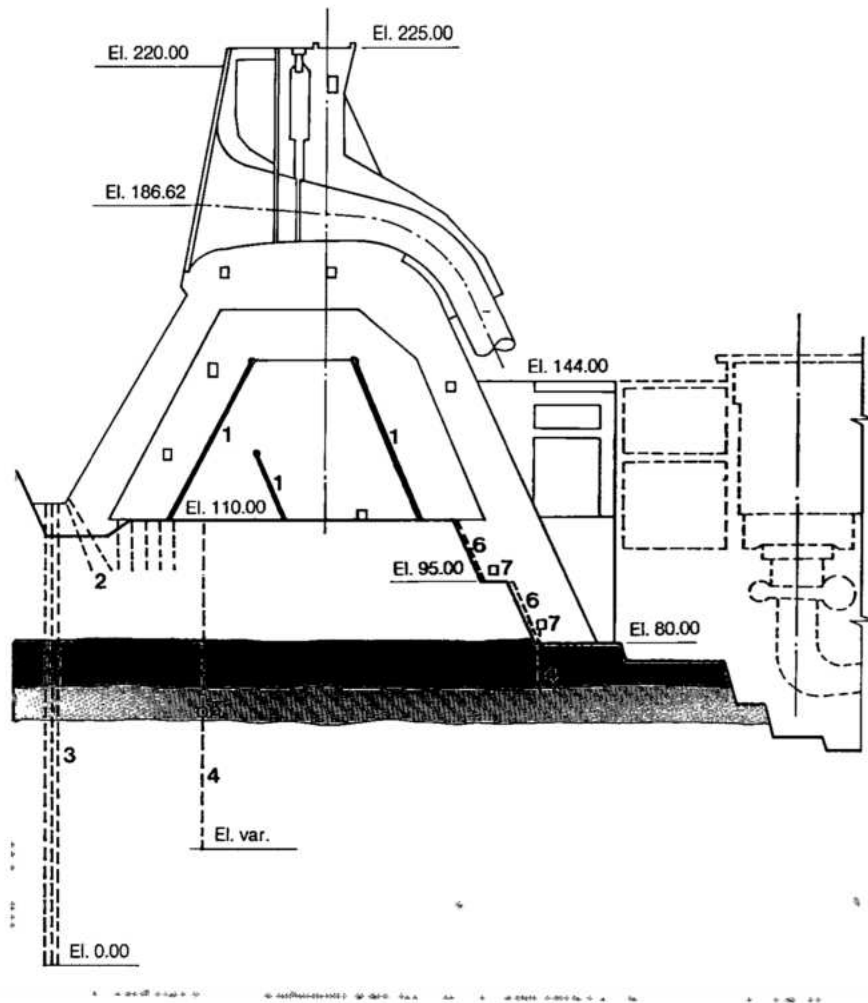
Foundation treatment of blocks with stepped downstream rock slope
